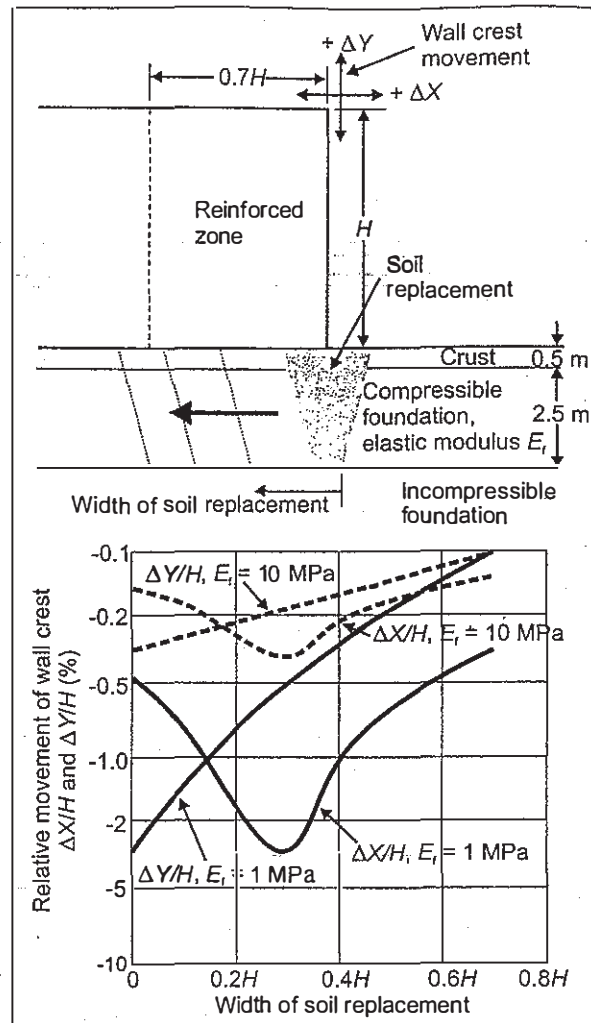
Effect of foundation soil replacement on vertical and horizontal movements at the crest of reinforced soil walls.
